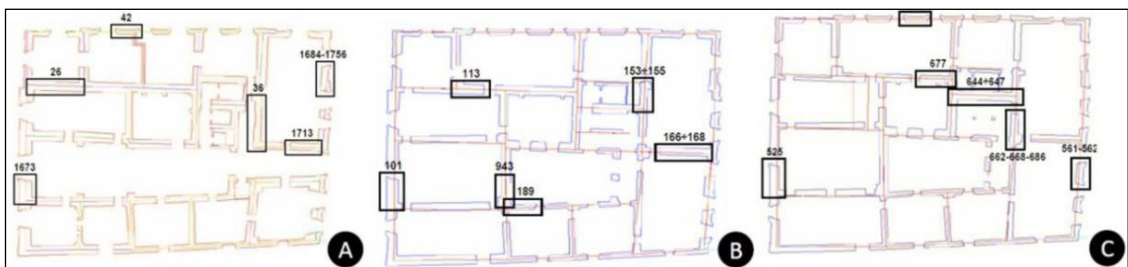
Masonry walls subjected to verify: a) Ground floor, b) First floor, c) Second floor.
